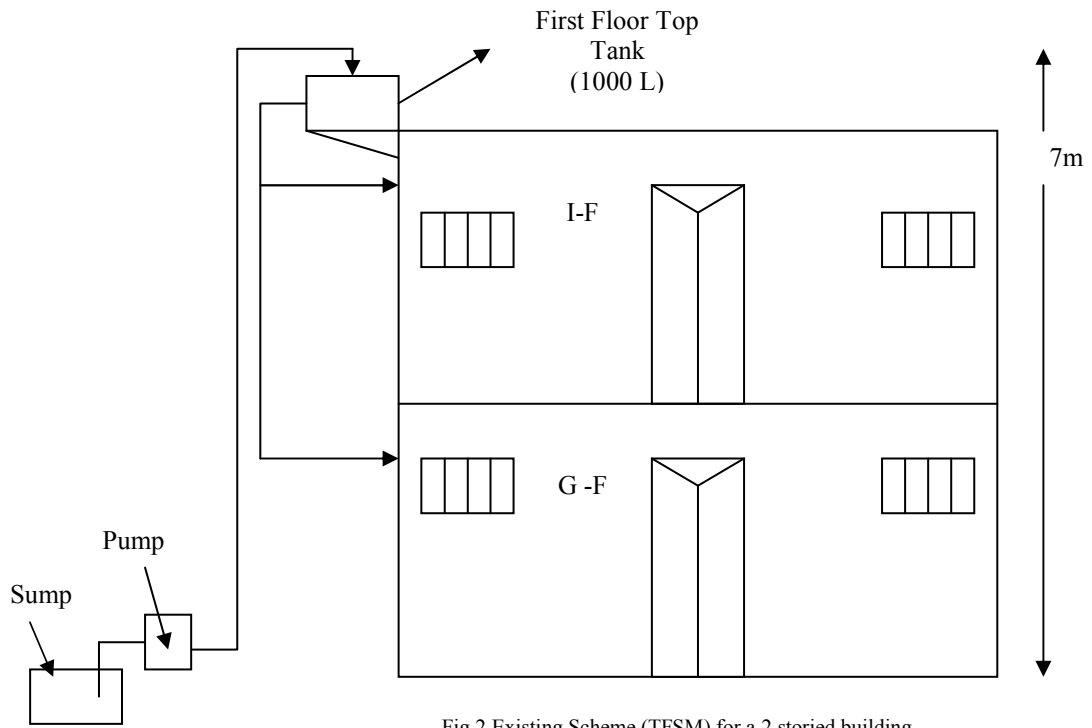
Existing Scheme (TFSM) for a 2 storied building
